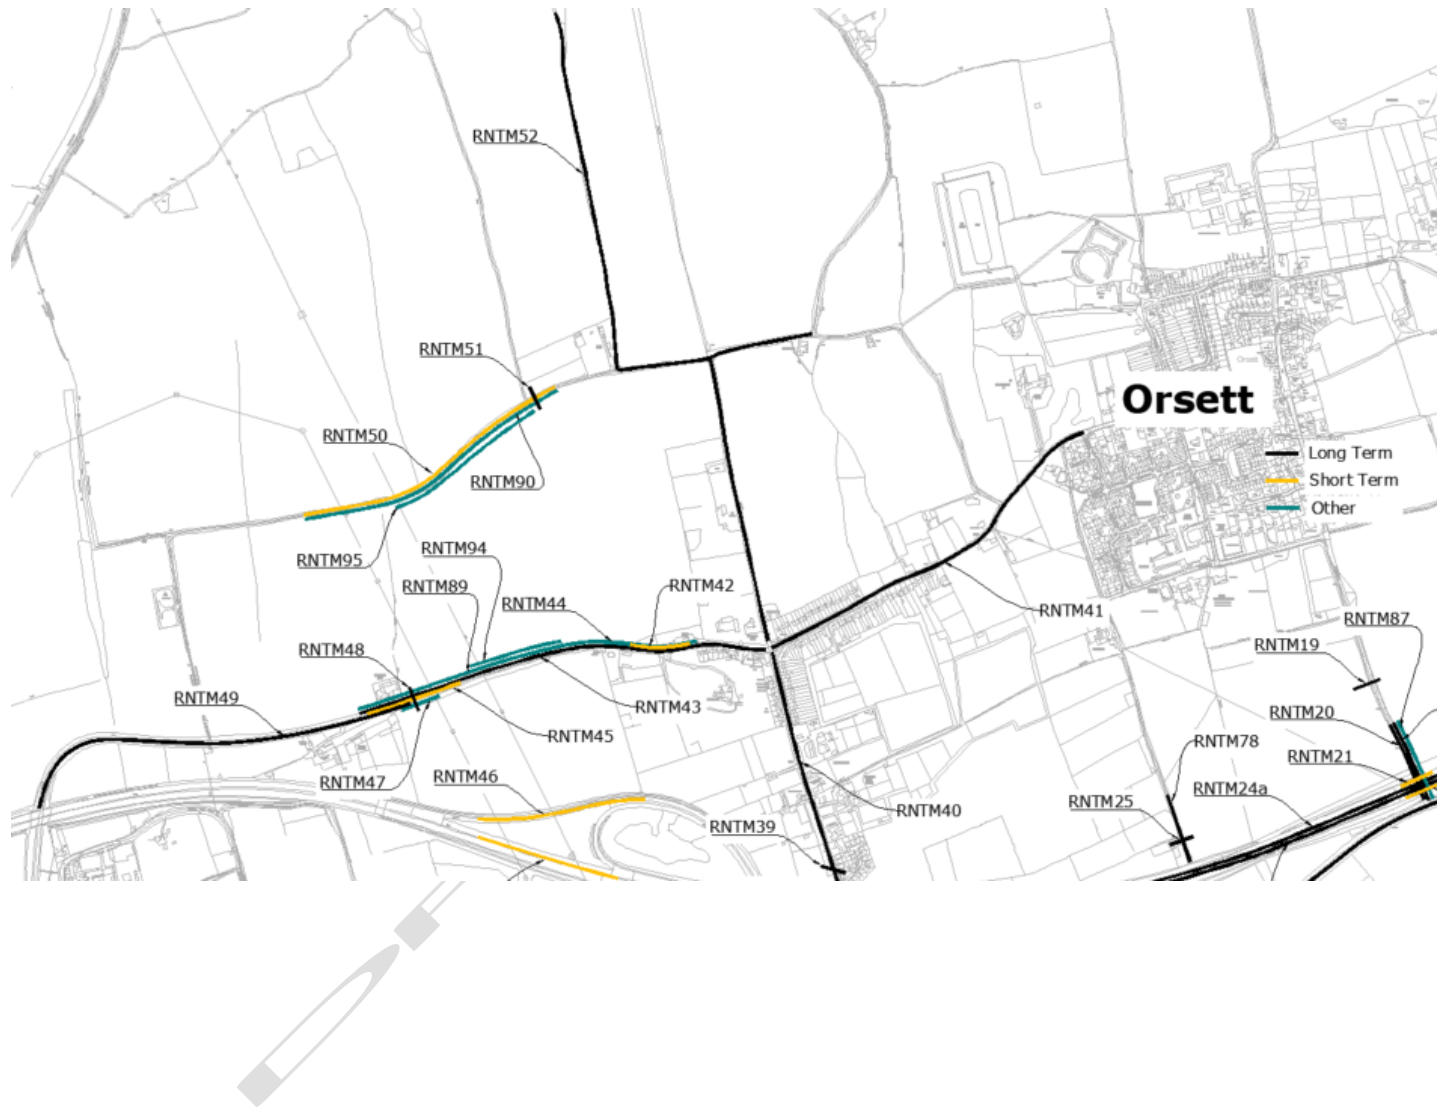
Roads North traffic management measures location plan (5 of 7)
